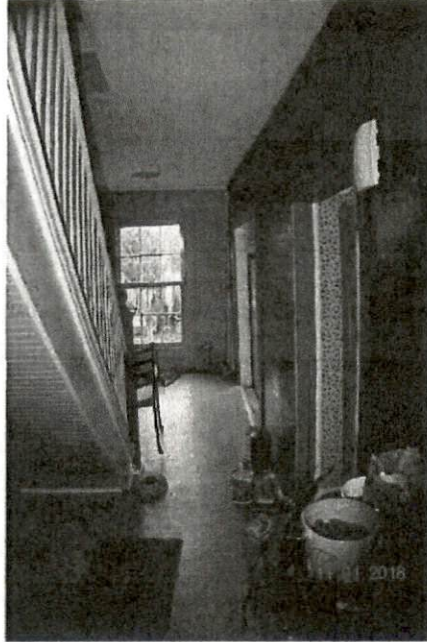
There is a load bearing wall between the hallway and kitchen. The floor is framed differently on each side of this wall. The hallway side (to the right in this photo) of the rear wall is pushed out a bit.
